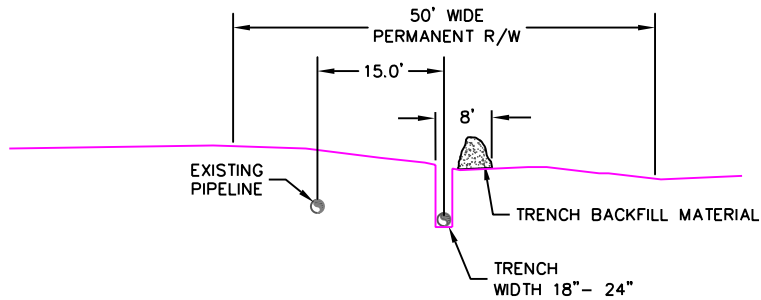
Typical Section of Gas Sales Pipeline Parallel to an Existing Pipeline, WRPA.
